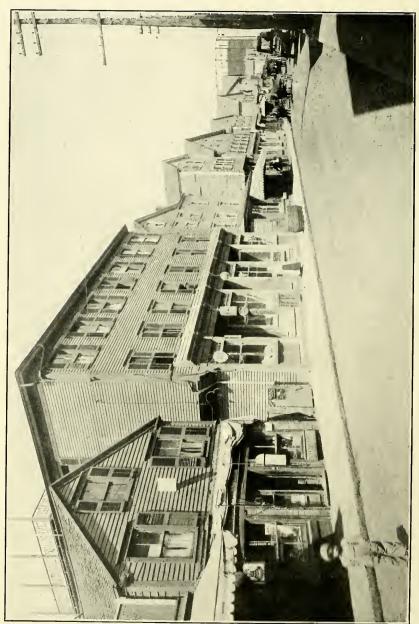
PLATE VIII.—OLD COTTAGES RAISED, WITH STORES BUILT BENEATH.
